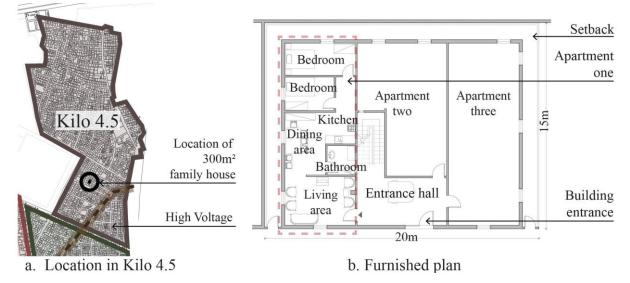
The 300m² family house: (a) Location in Kilo 4.5 area, (b) ground floor plan with one furnished apartment.
